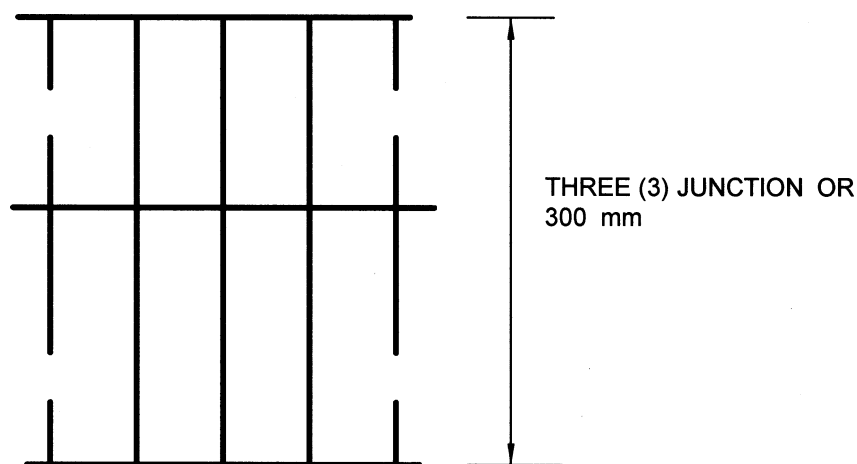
SPECIMEN DIMENSIONS FOR METHOD B AND C
